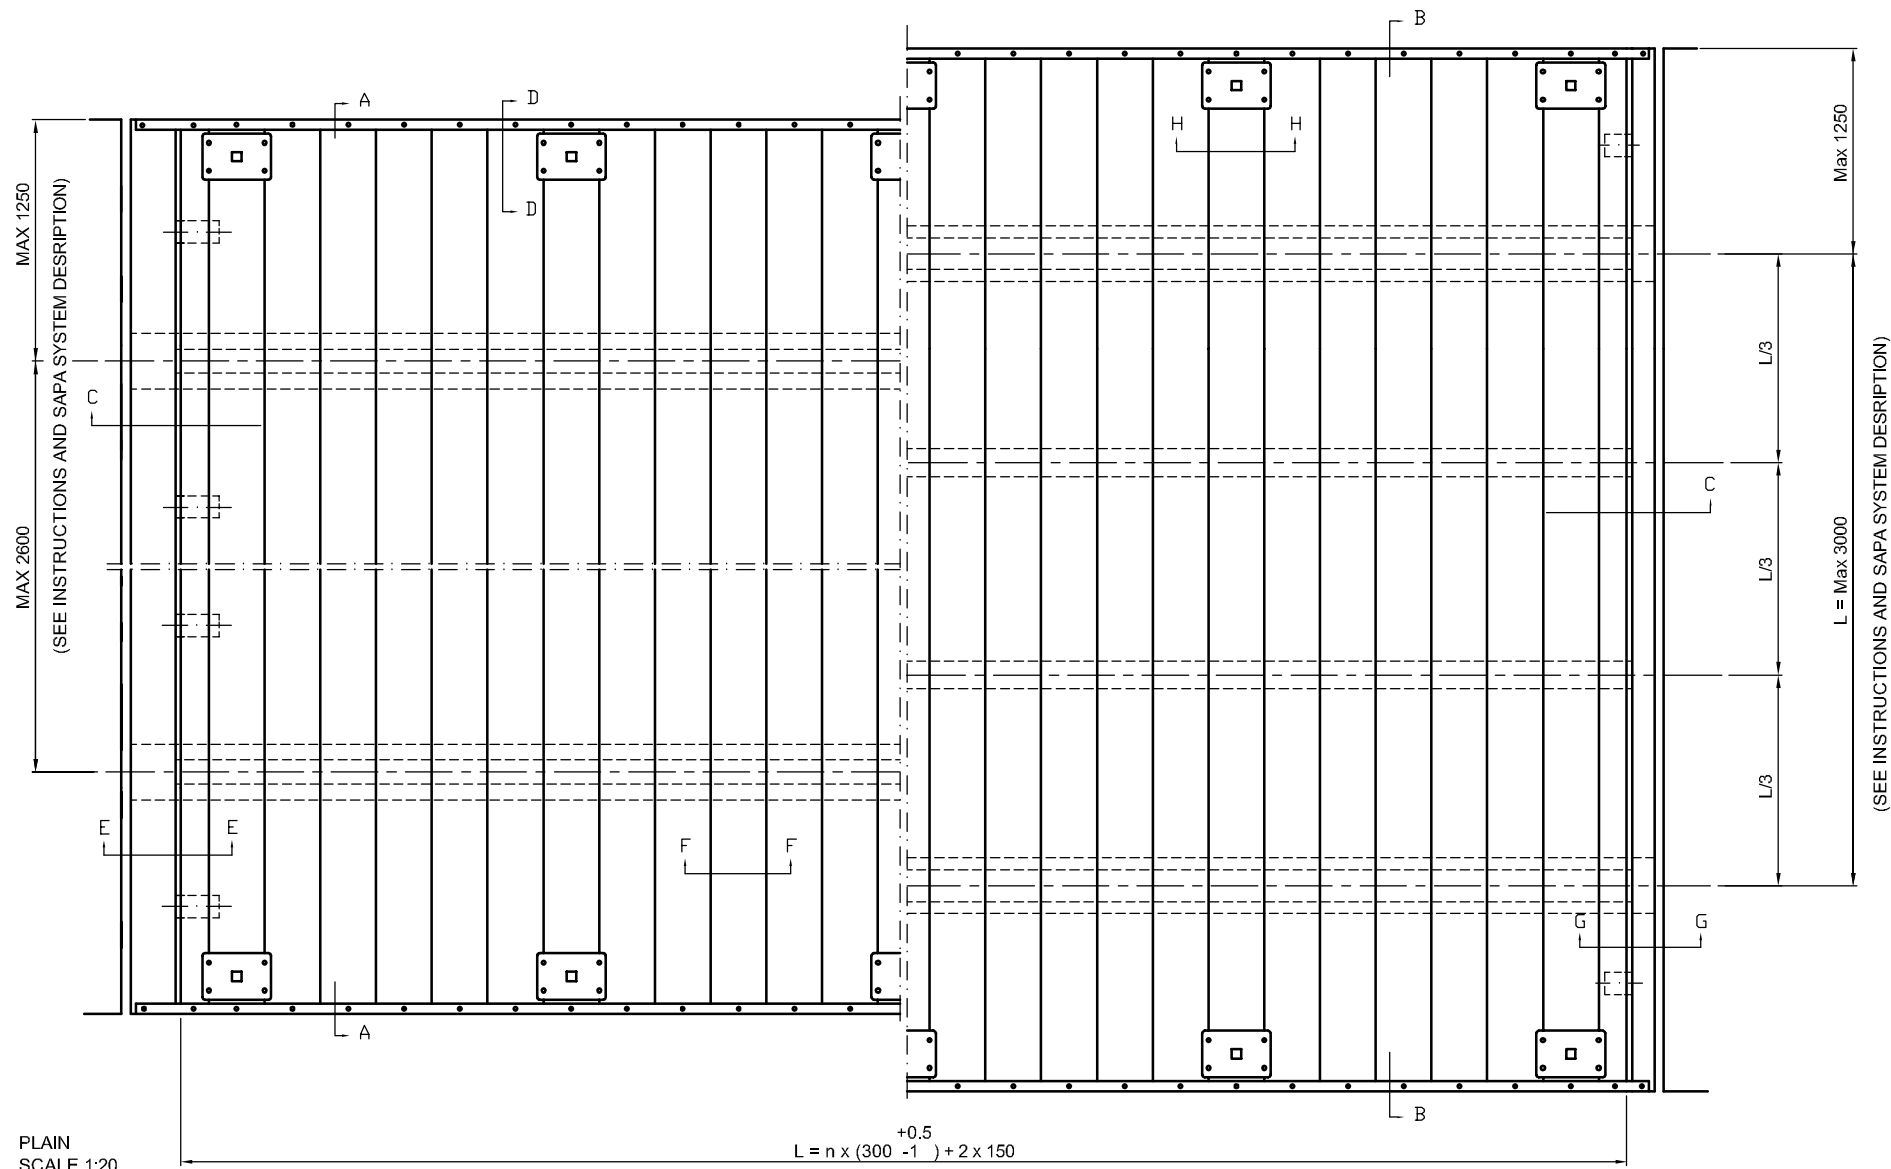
, 3, 4, 6 and 7 according to drawing F1-3125.
